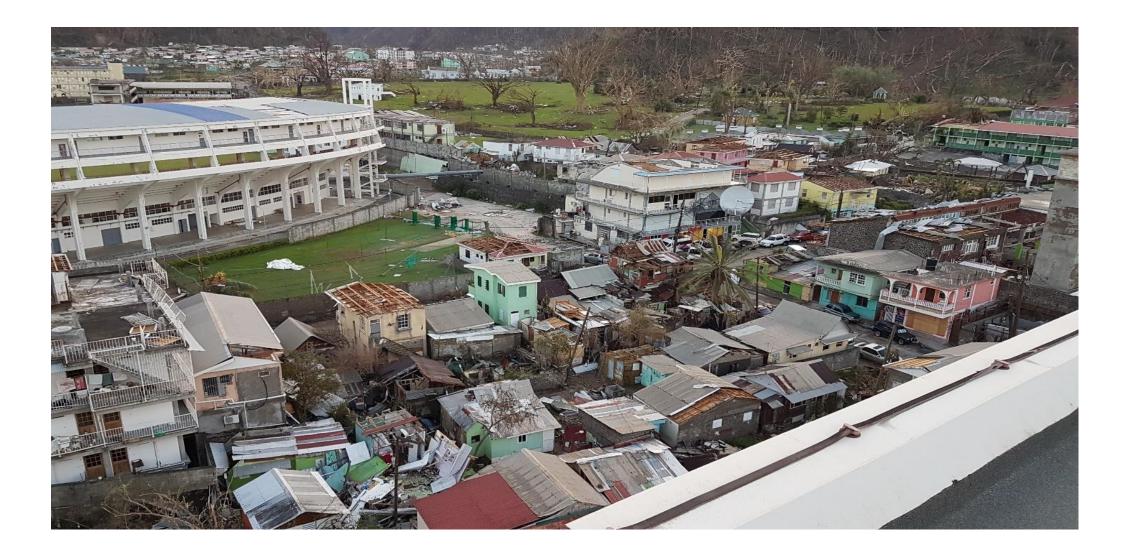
HOUSING DAMAGE OUTSIDE STADIUM #3
